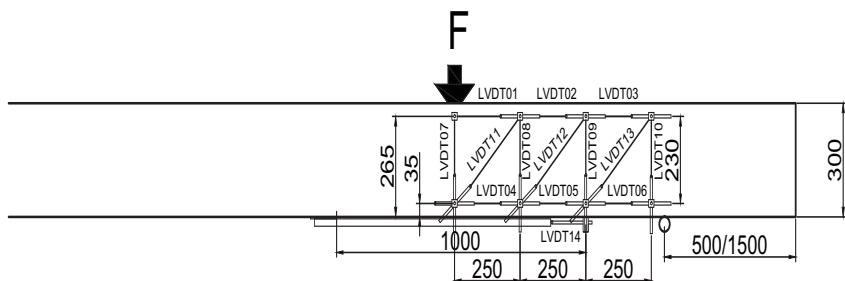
LVDT layout and numbering for 300 mm deep beams
